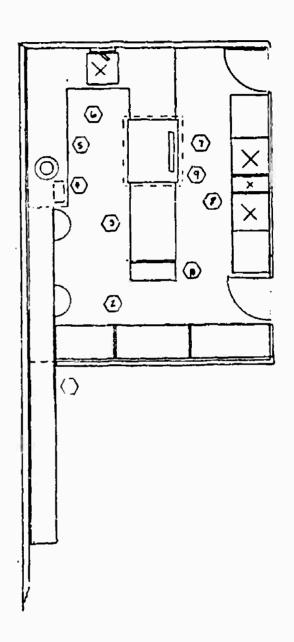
Dining Halls "B" and "C" Scullery Plan.
